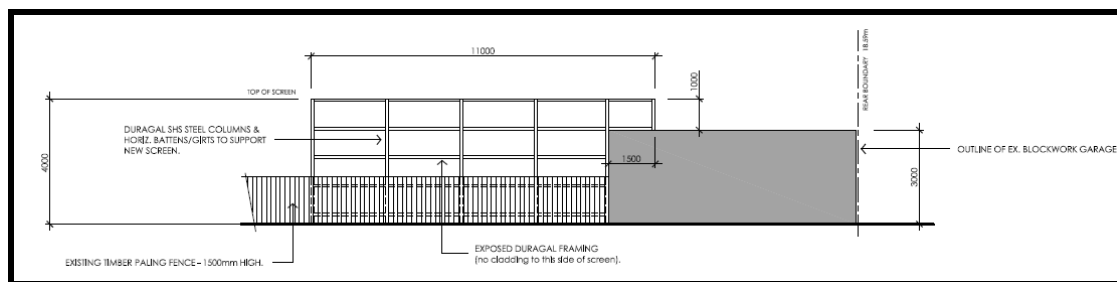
An elevation view of the proposal, viewed from the adjoining lot.
